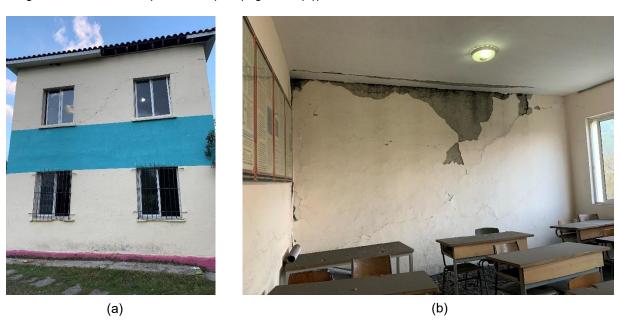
Severely damaged school in Pezë: (a) diagonal cracking of second story walls and (b) damage from the inside (photos: Markel Baballëku).
